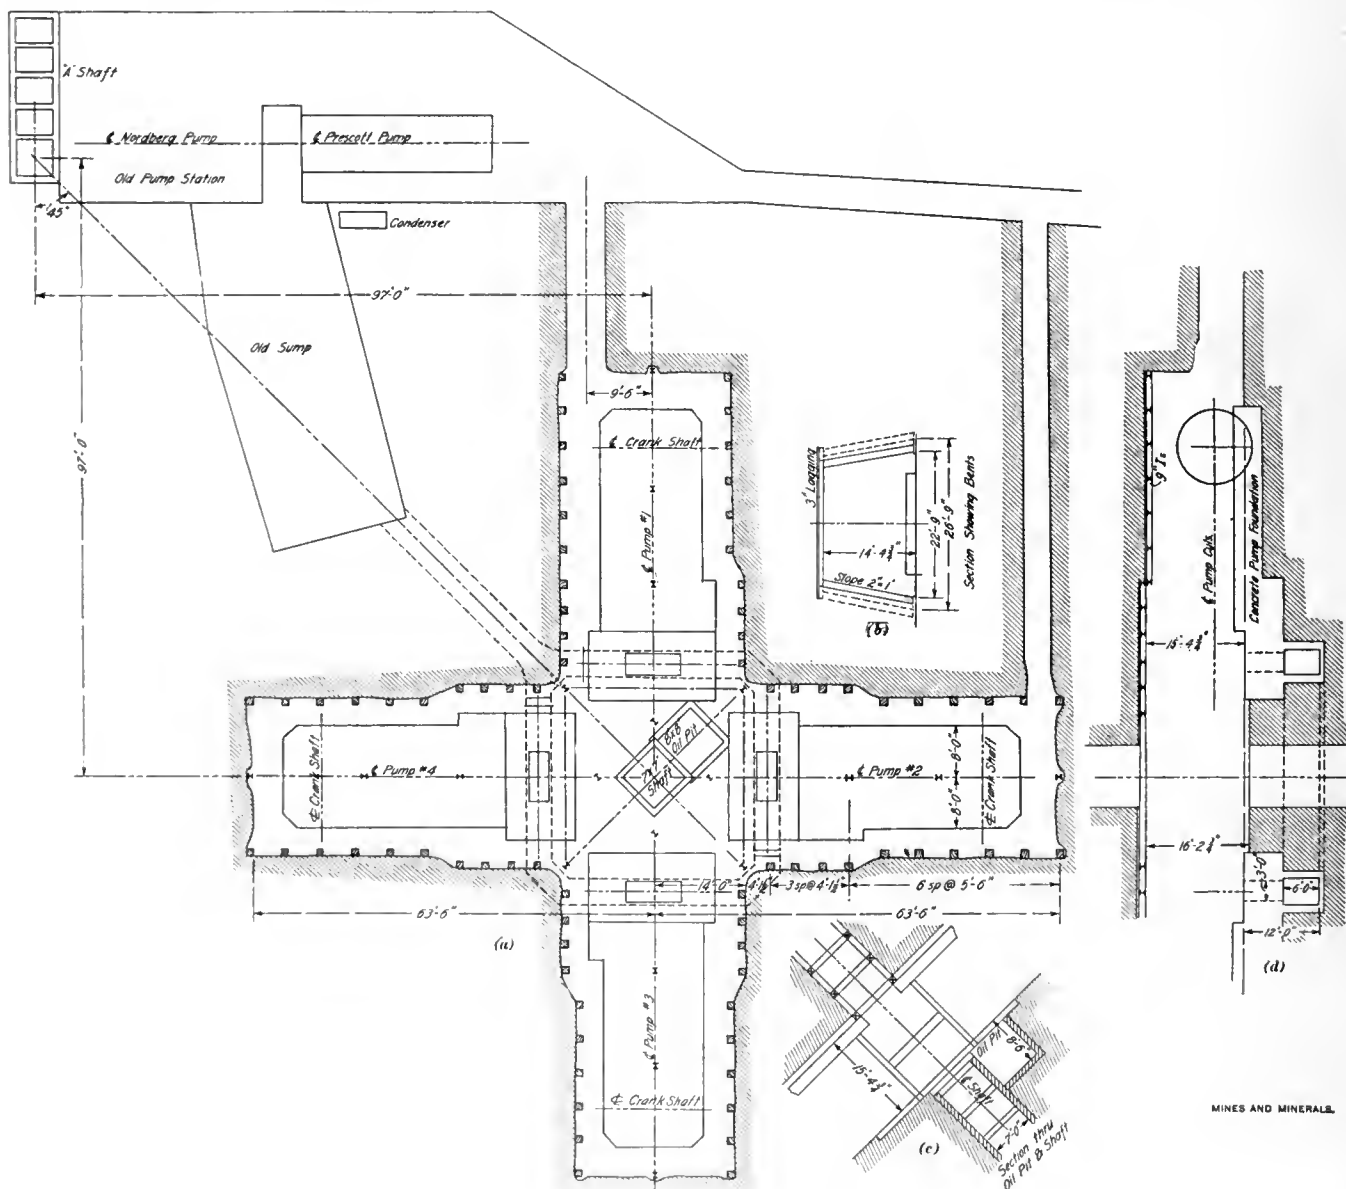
PLAN OF PUMP STATION, 1,200-FOOT LEVEL "A" SHAFT
